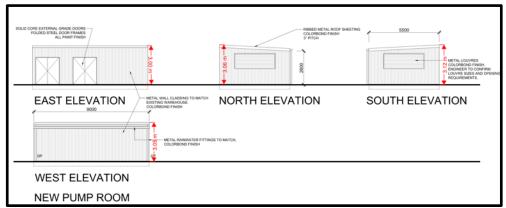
Proposed Height of Pump Room as measured on the Architectural Plans (Source: Tim Farrell Pty Ltd, 2021).
